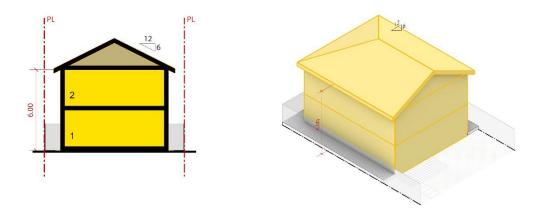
Accessory residential building with a maximum main wall height of 6.0 metres and a pitched roof.
